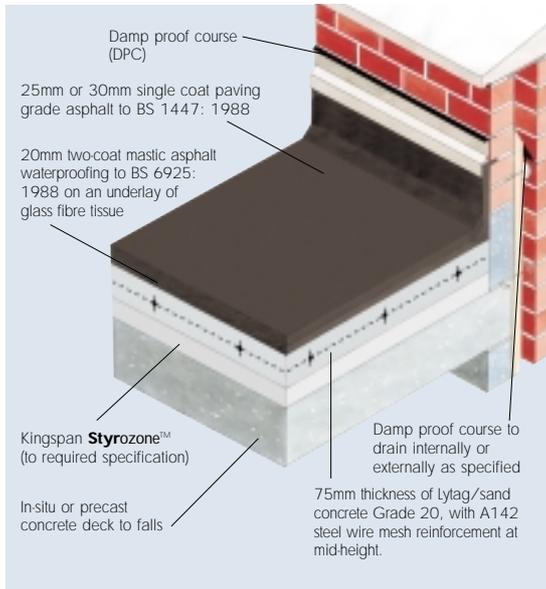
CONCRETE SLAB FINISH LOADING BAYS AND SERVICE DECKS COMMERCIAL VEHICLES (design should be verified as to suitability for specific wheel loads)
